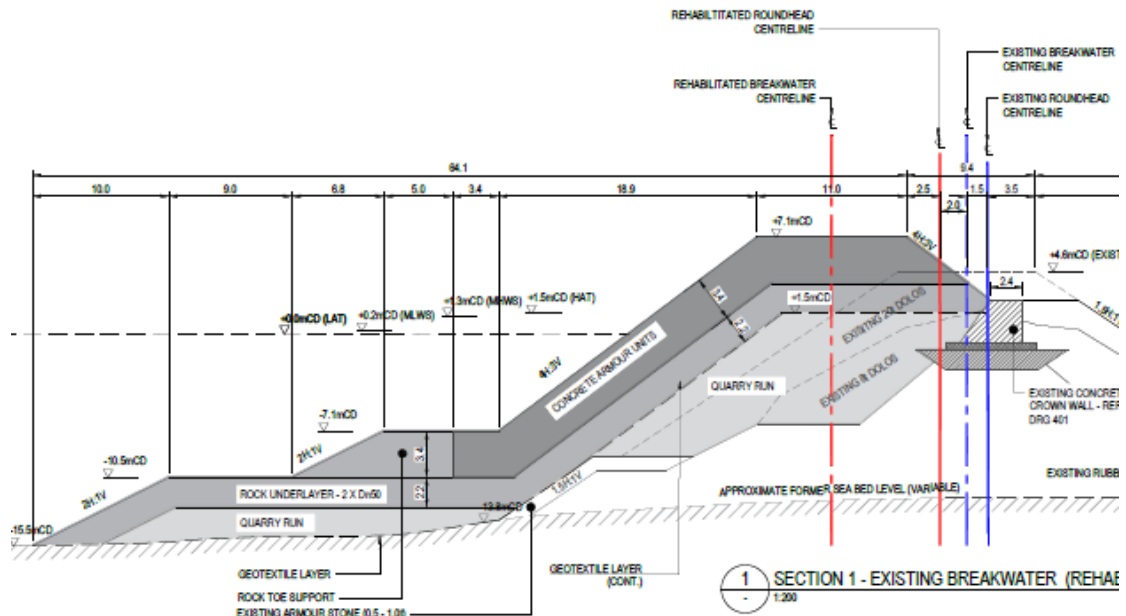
Reconstructed Option Typical Cross Section (Preliminary Design)
